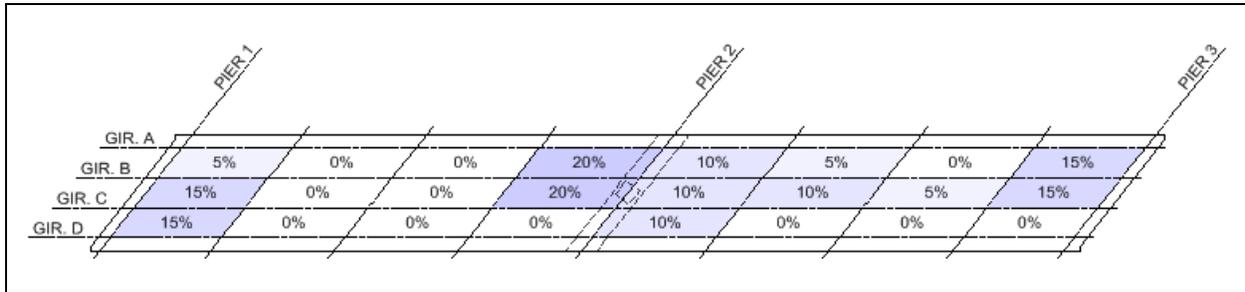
Bridge 2/8.5N-W Crack Intensity Diagram
